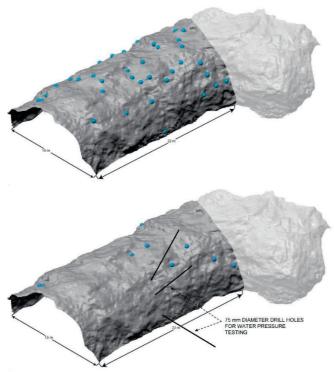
3D views obtained by LiDar scanning of the SCL section at the Karmsund subsea tunnel test site. Top: Seepage points in the form of drip spots though the substrate before the application of the waterproofing membrane. Bottom: remaining damp points at approximately 5 months after the application of the final inner lining. No post injection was carried out to remove the remaining seepages.
